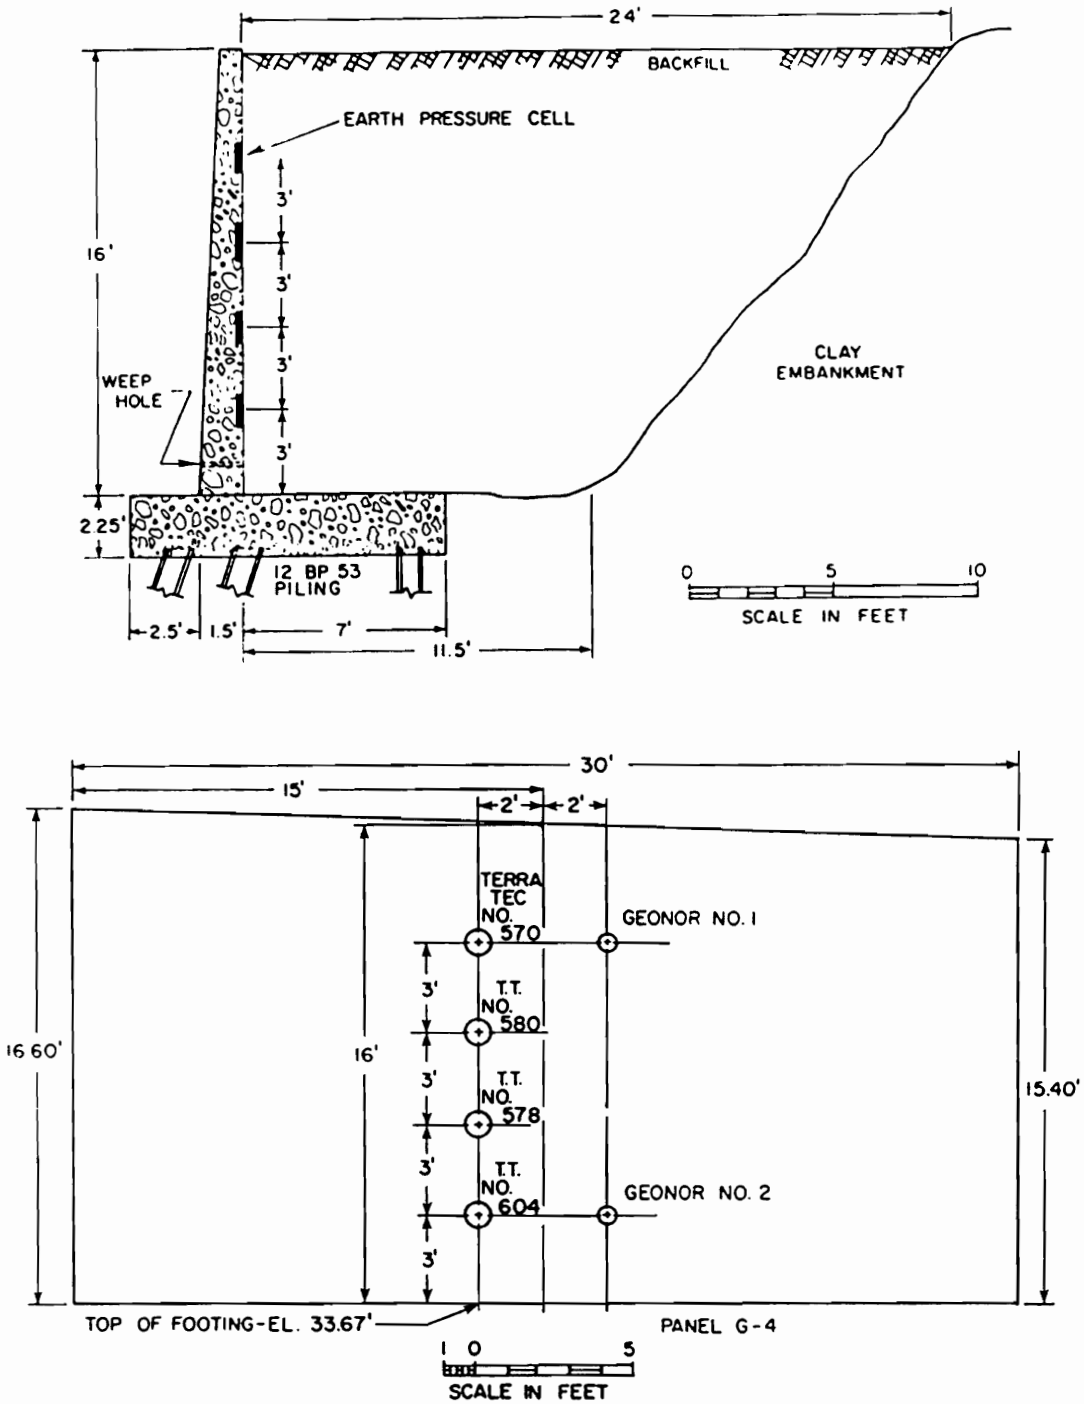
Cross Section and Elevation of Test Wall G, Highway US-59, Houston, Texas (Wright, et al., 1975).
